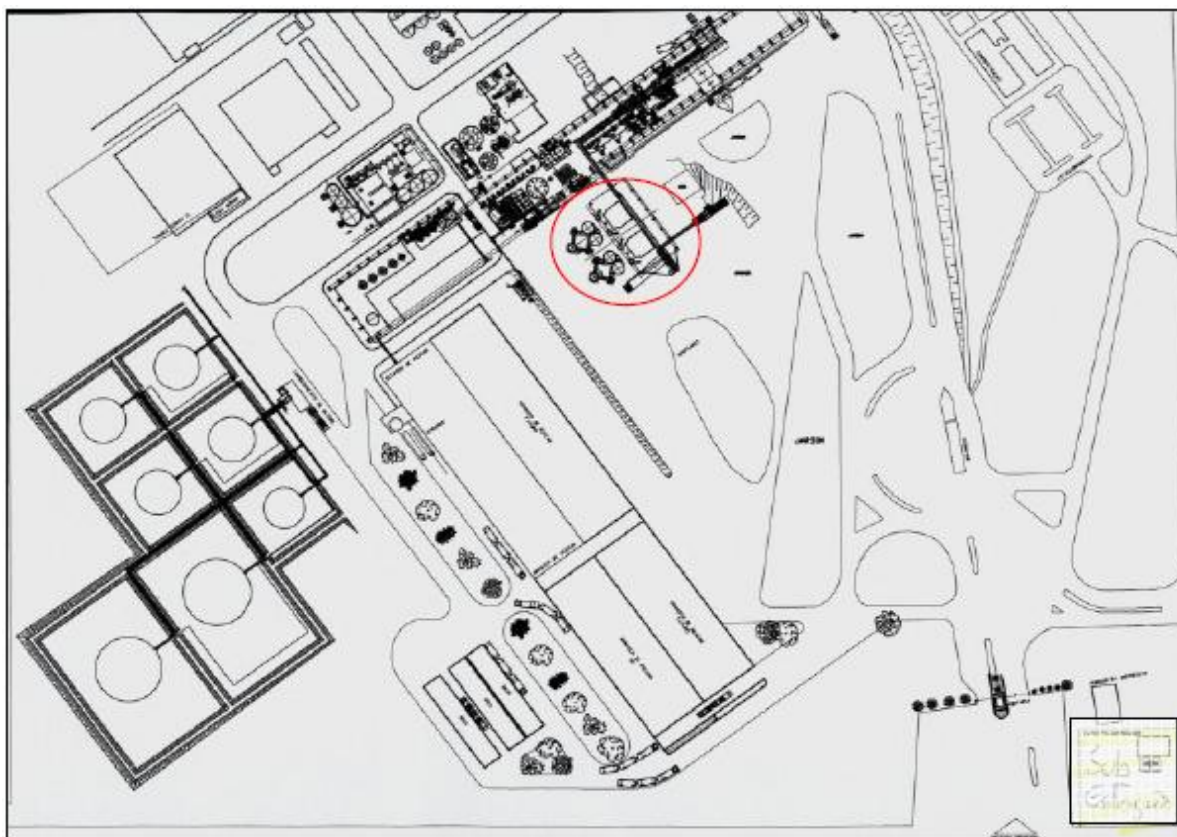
Location of installed equipments for bagasse cogeneration at Jalles Machado site
